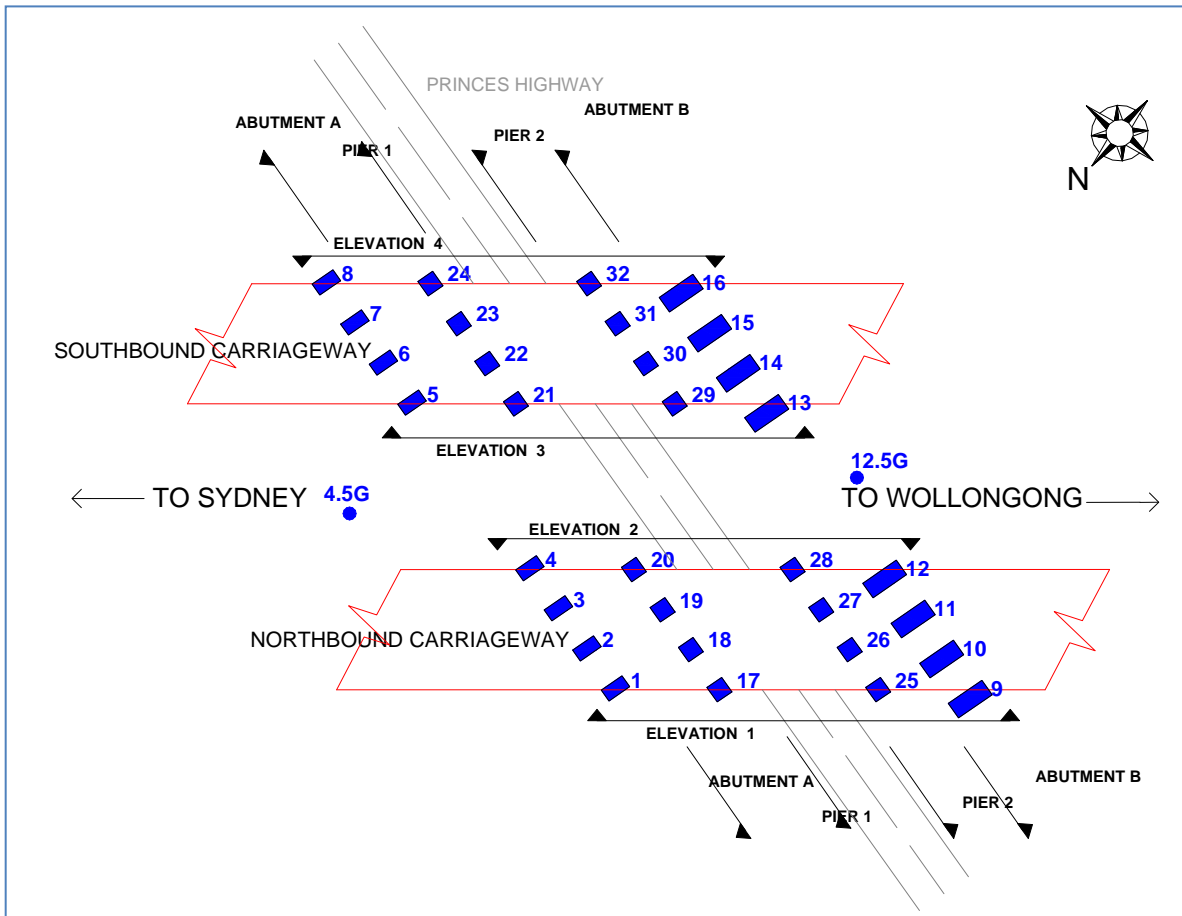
Bridge 2 - Column and Blade Wall Plan View
